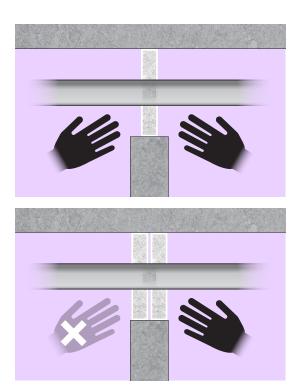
Access on the left-hand side double-sided access illustrated and on the right-hand side the impact where there is single-sided access only
